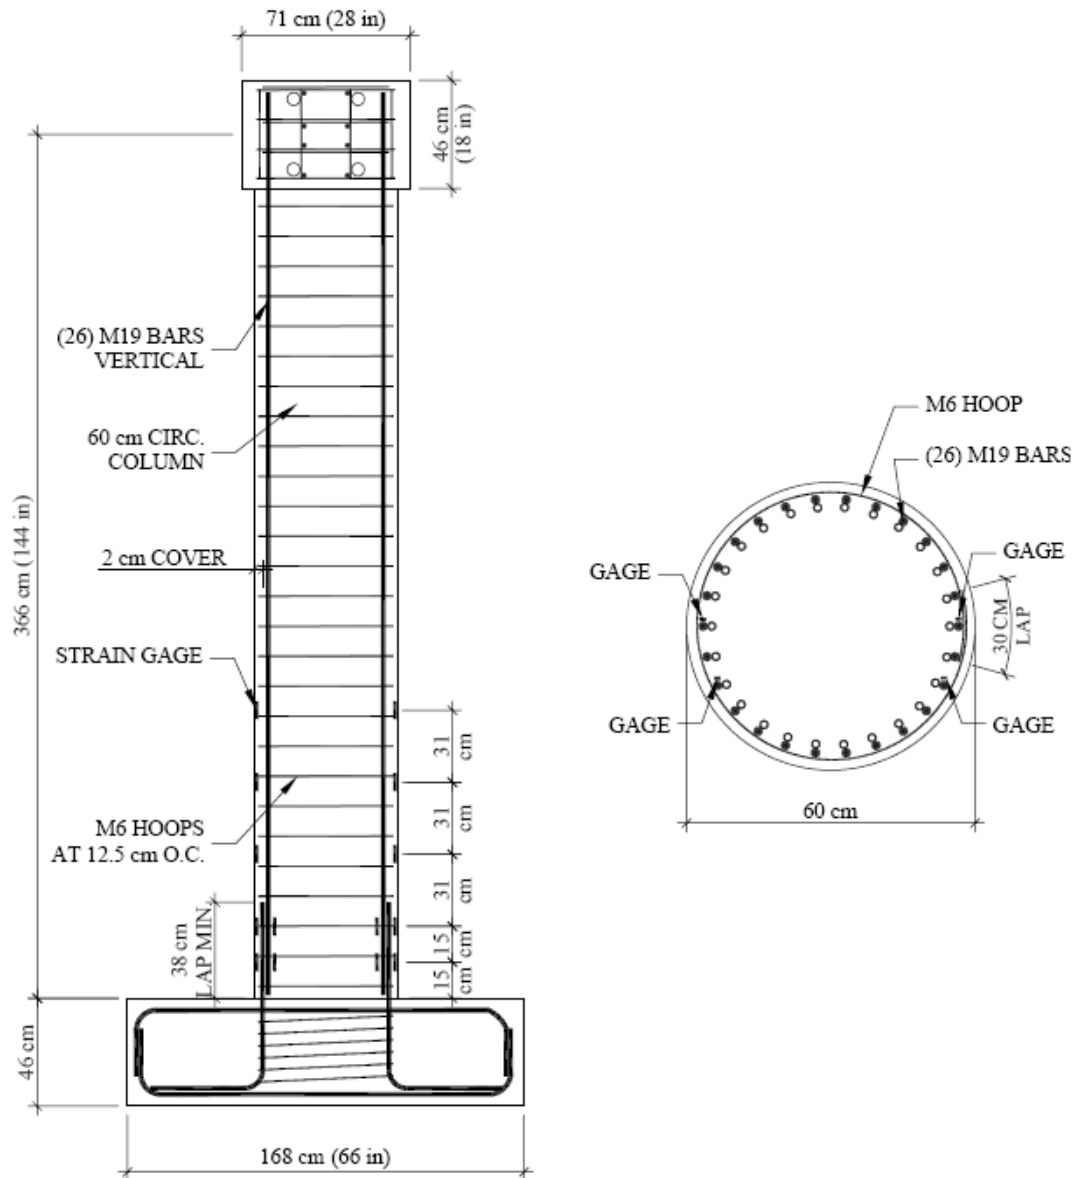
Schematic Showing Strain Gage Location on Lapped Reinforced Flexural Circular Column Reinforcing Cage
